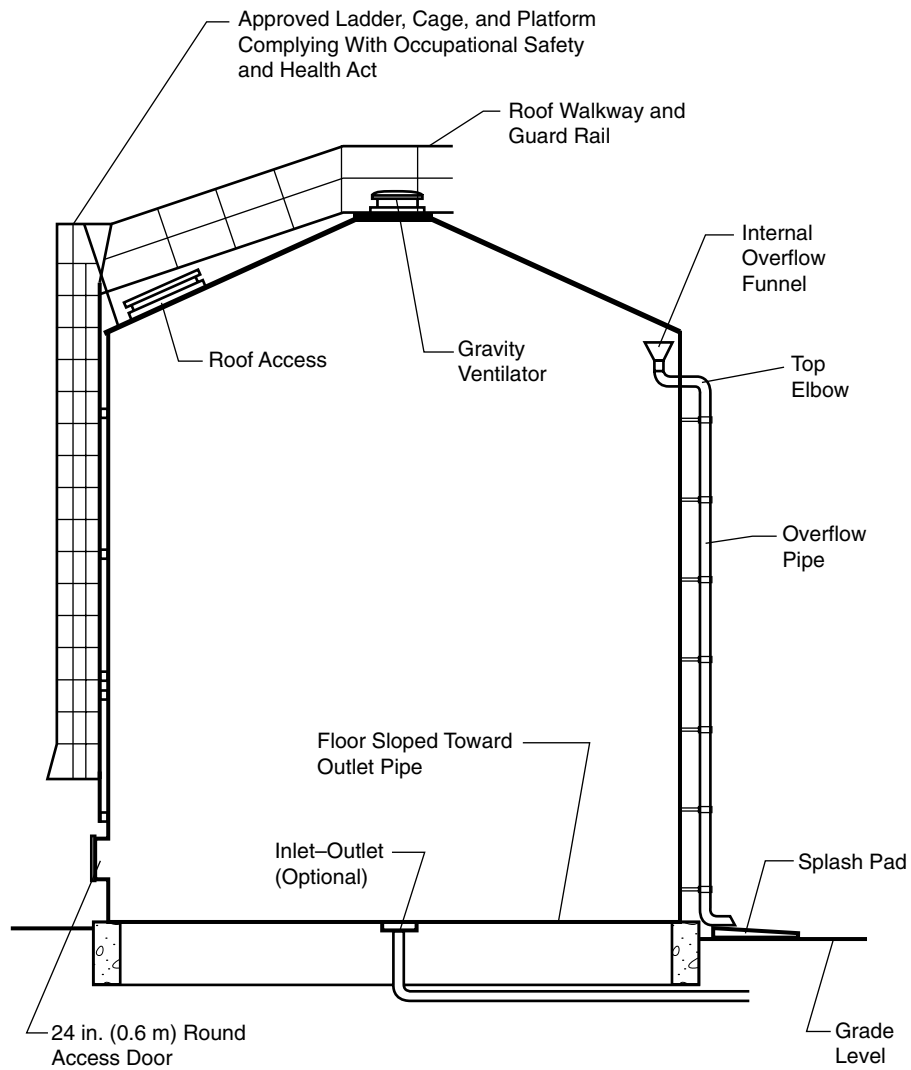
Cross-sectional view of a bolted steel standpipe
